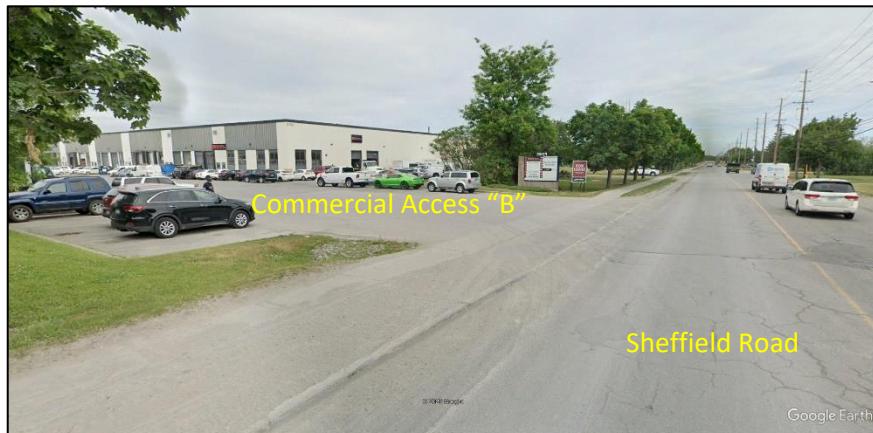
Sheffield Road / Commercial Access “B”
